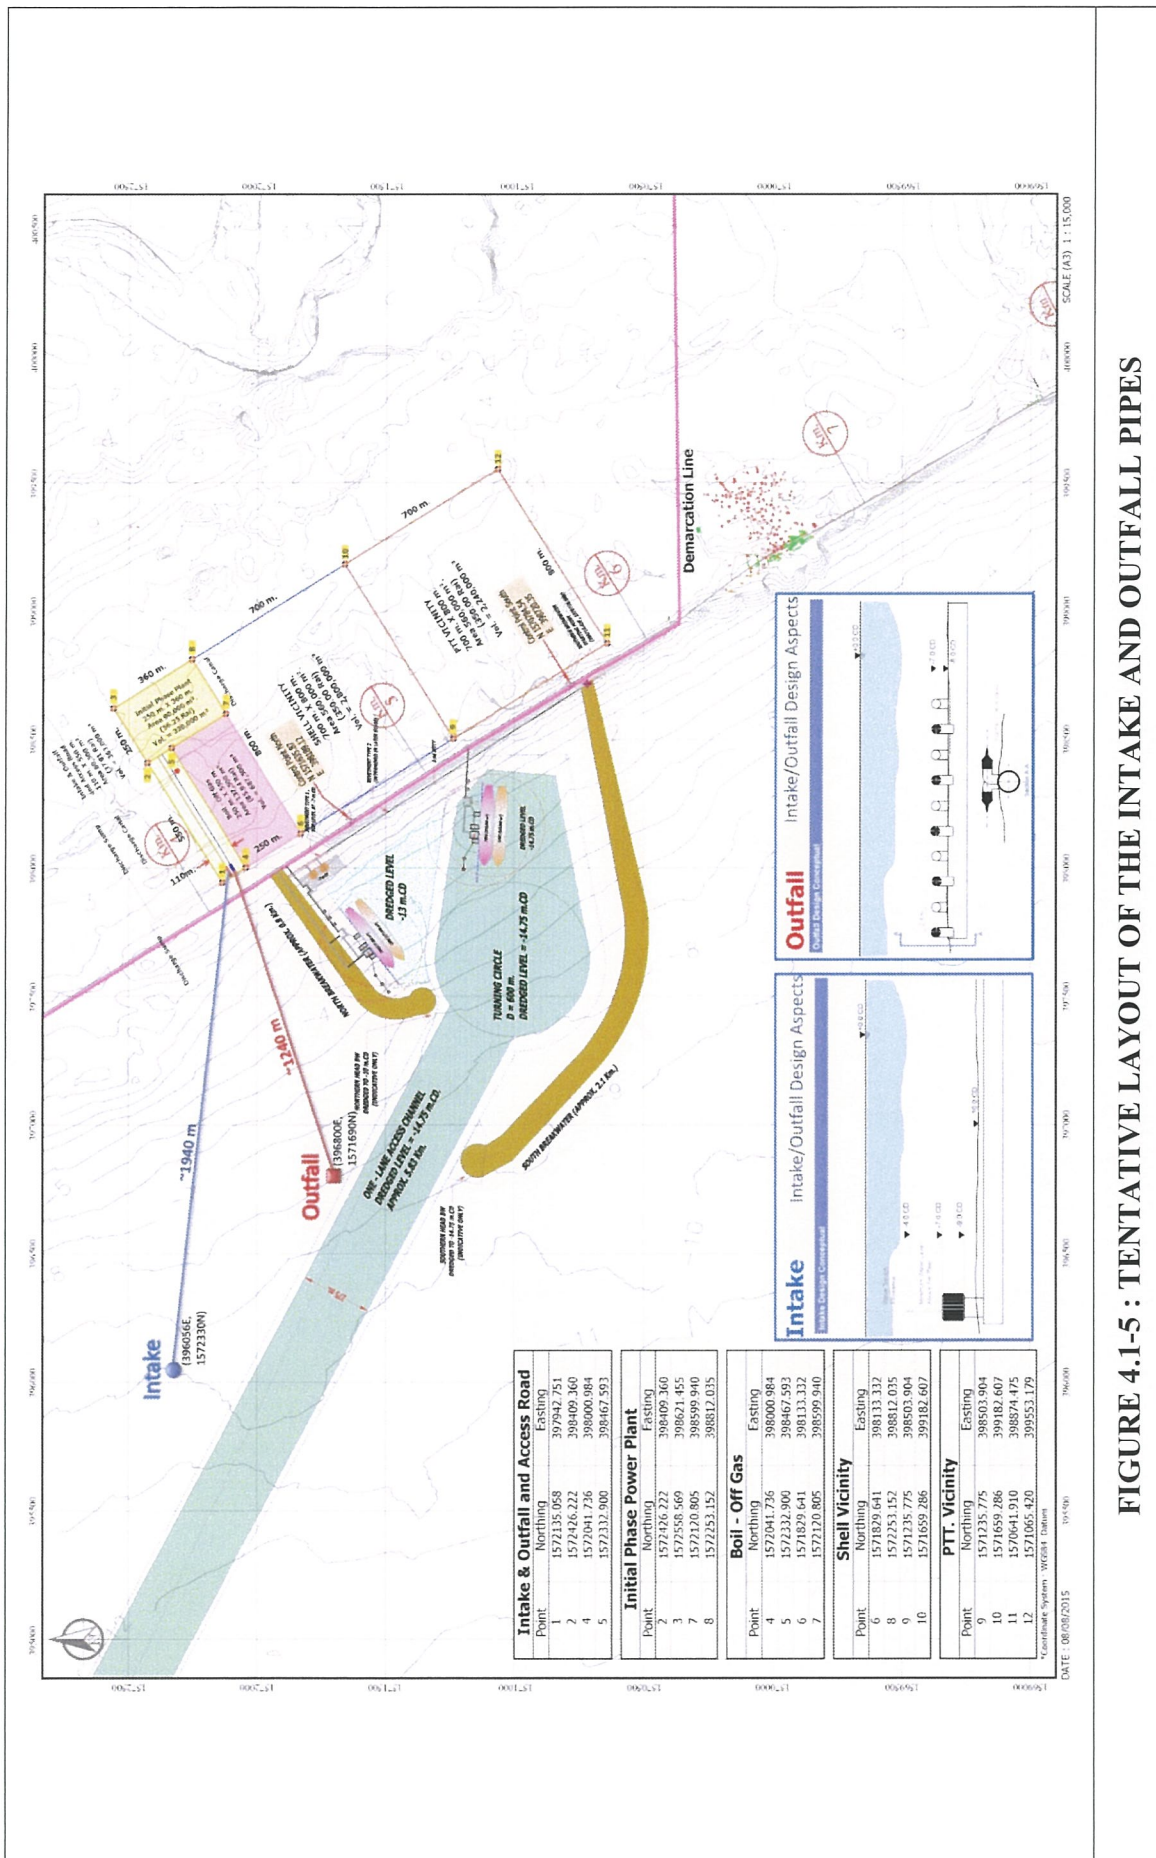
TENTATIVE LAYOUT OF THE INTAKE AND OUTFALL PIPES
